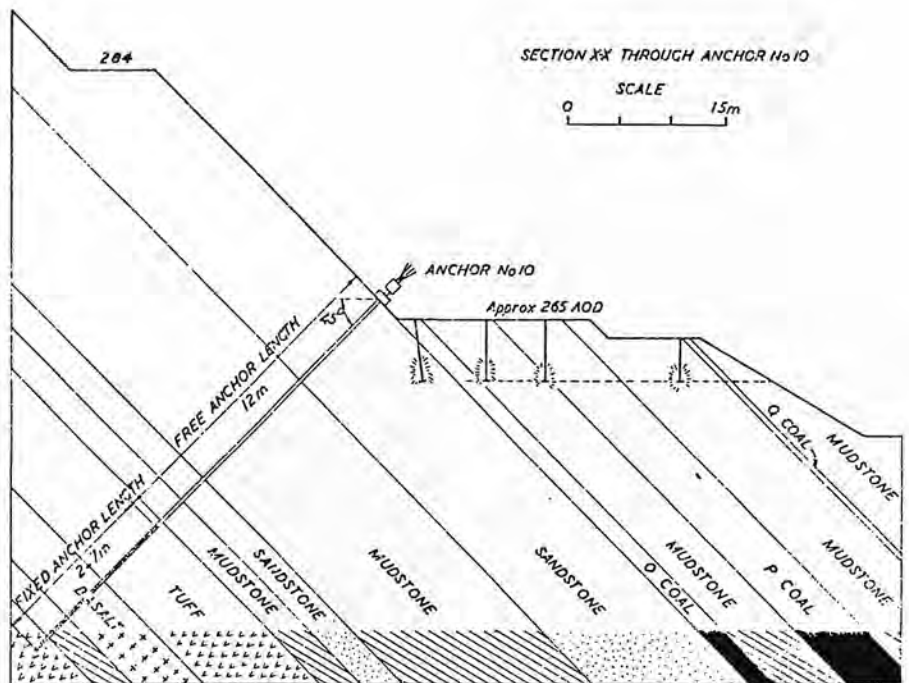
Typical section X-X through Rock Anchor Zone (see Fig 10).
